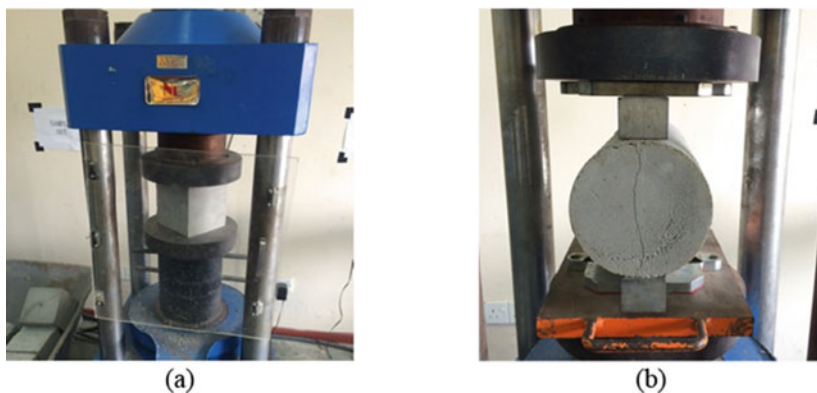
Experimental test a Compression test b Spilitting test test
